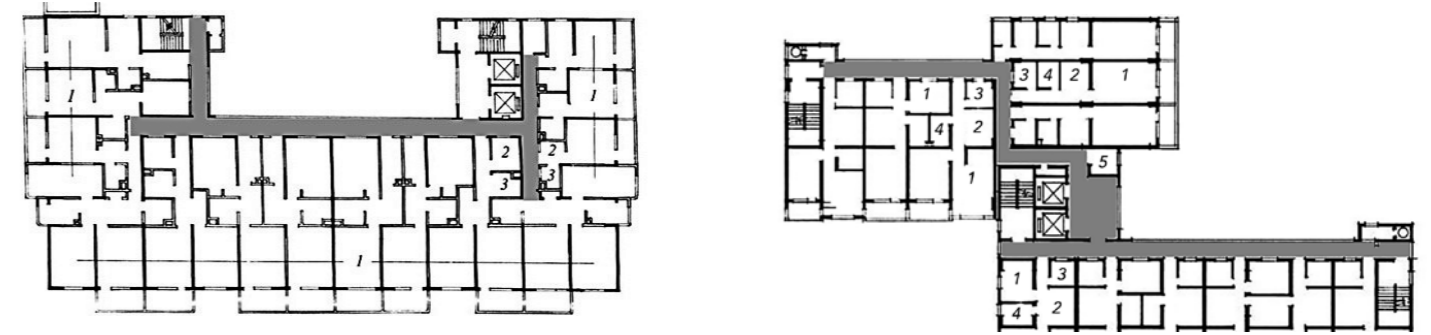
Floor plan of a 15-story building (1985) (picture left) and a 20-story building (1987) for reference (Source: Li Zhenyu, 2009)
